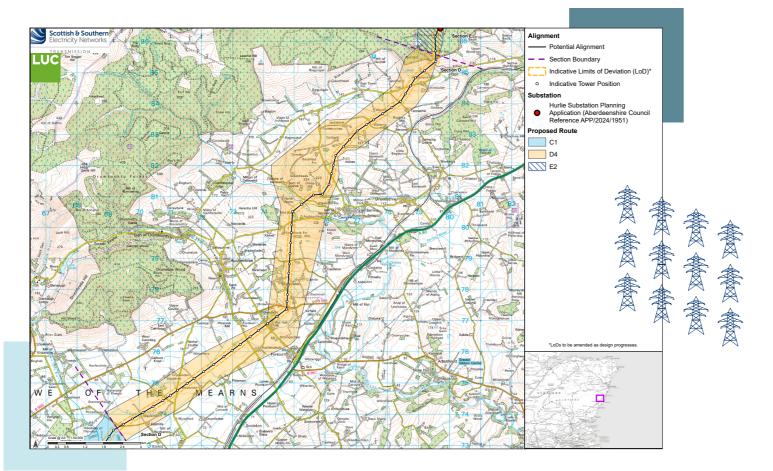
Location 4: Careston Alternative Alignments Detailed Plan
